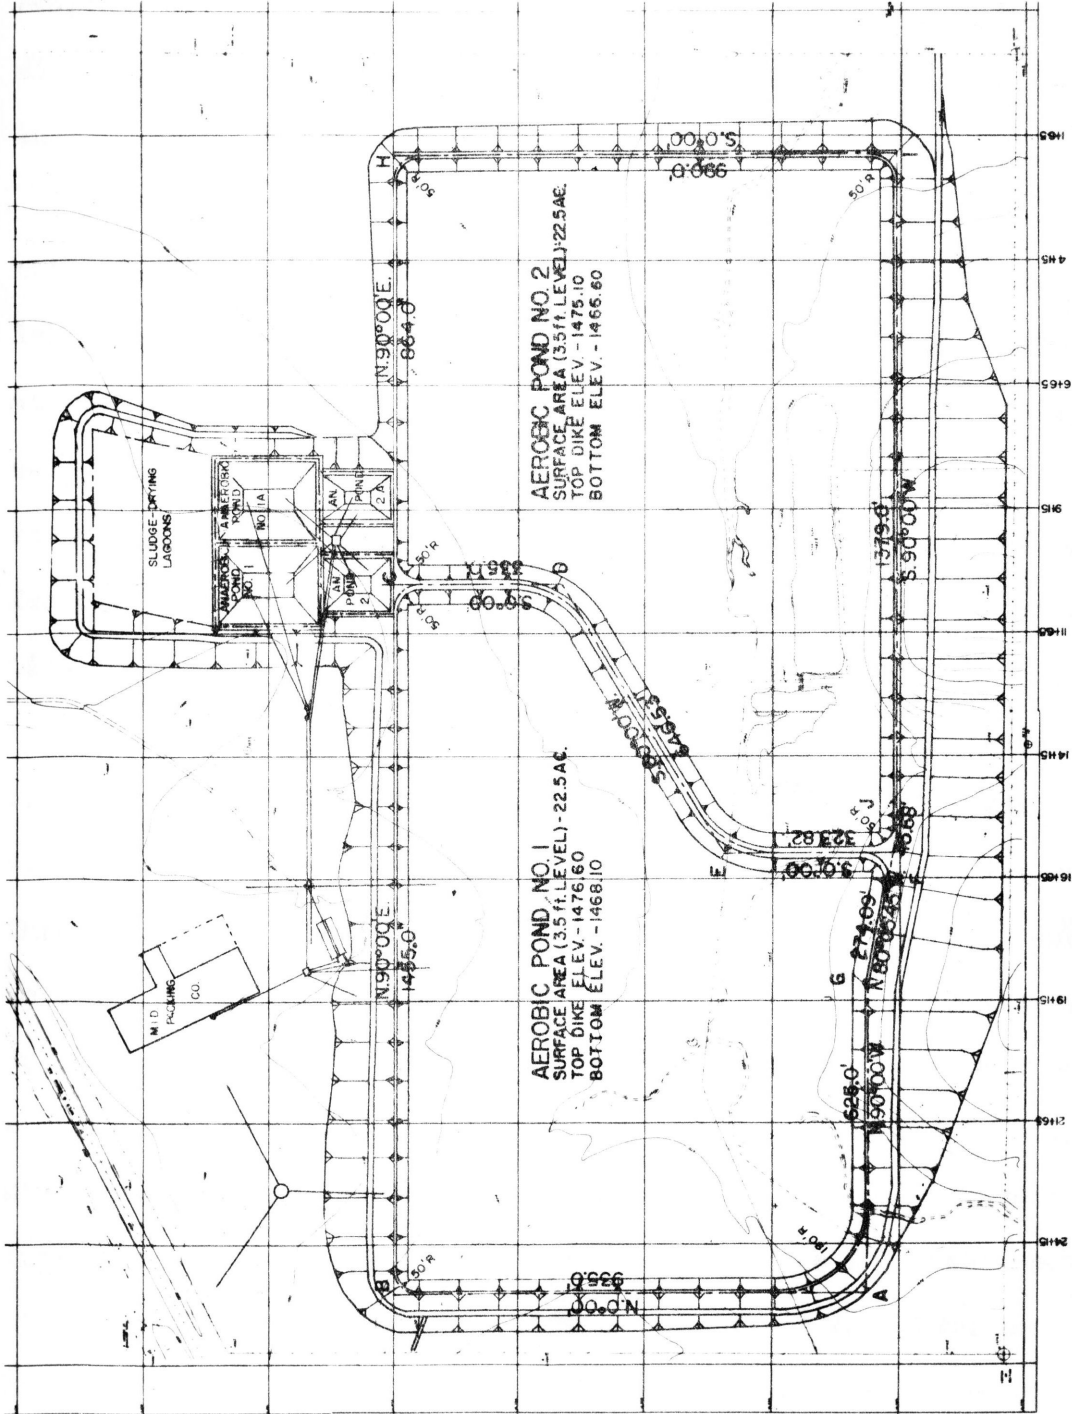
Topographic map of slaughterhouse and proposed waste treatment pond site
